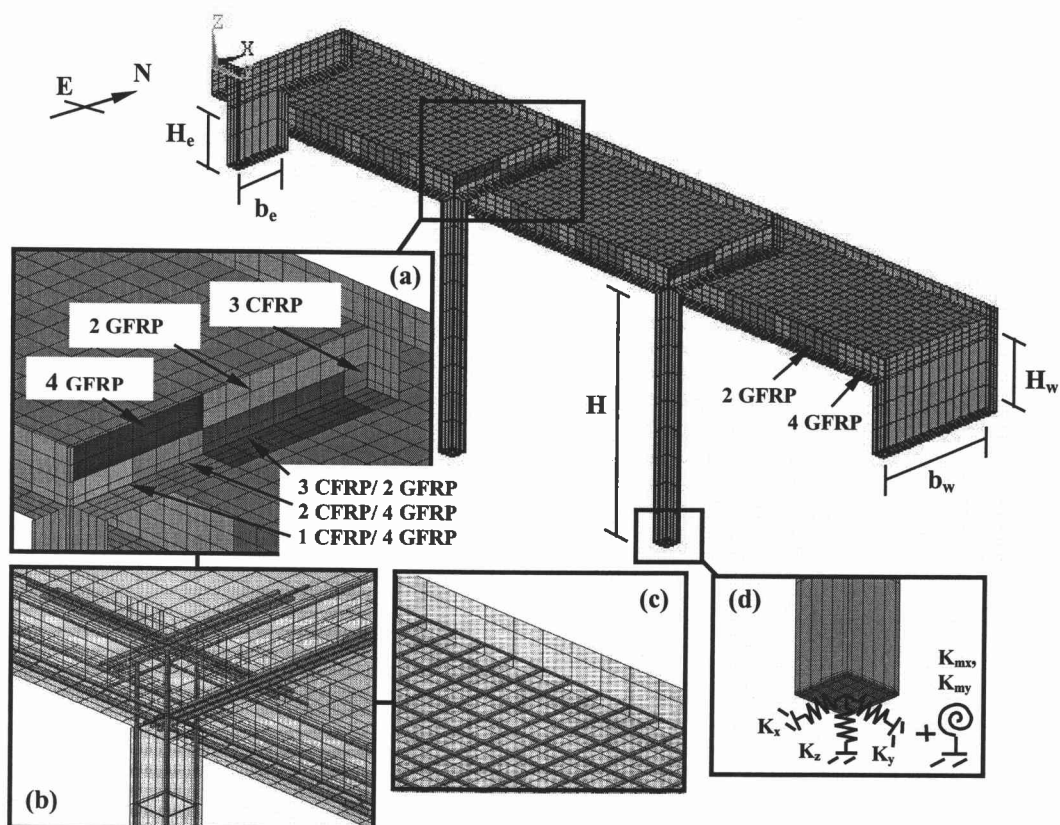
FE Bridge Modeling: (a) Typical FRP Reinforcement; (b) Typical Steel Reinforcement in Beams and Columns; (c) Typical Steel Reinforcement in Bridge Deck; (d) Typical Soil-Structure Interface Modeling
